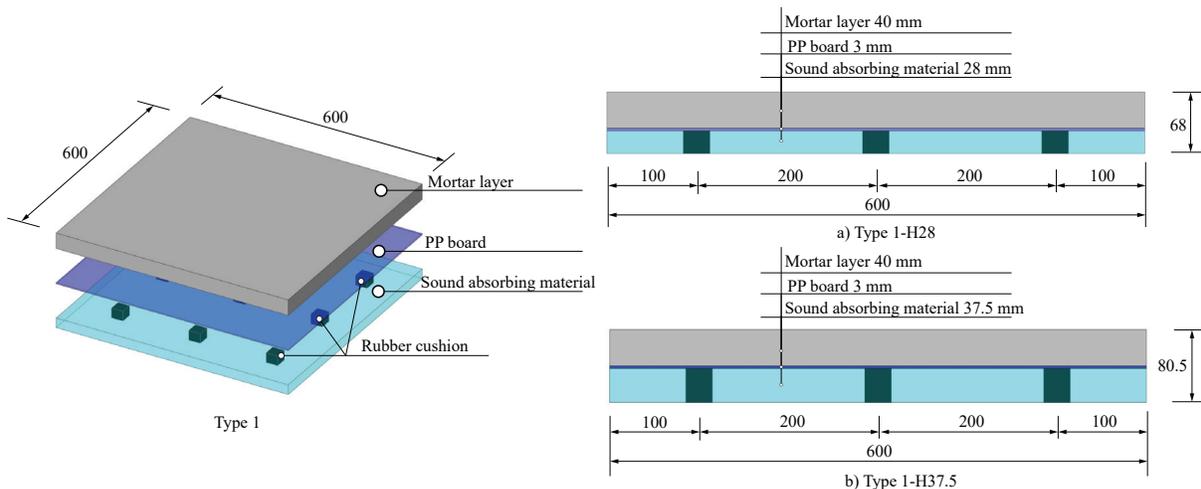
Configuration and cross-section of a module of the tested floating floor Type 1.
